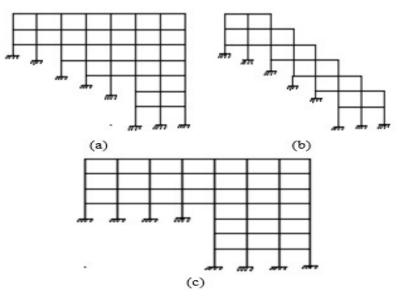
Hill building configuration (a) Step-back building (b) Setback-Step back building (c) Floors at two different levels [Source-De *et al.* (2018)]
